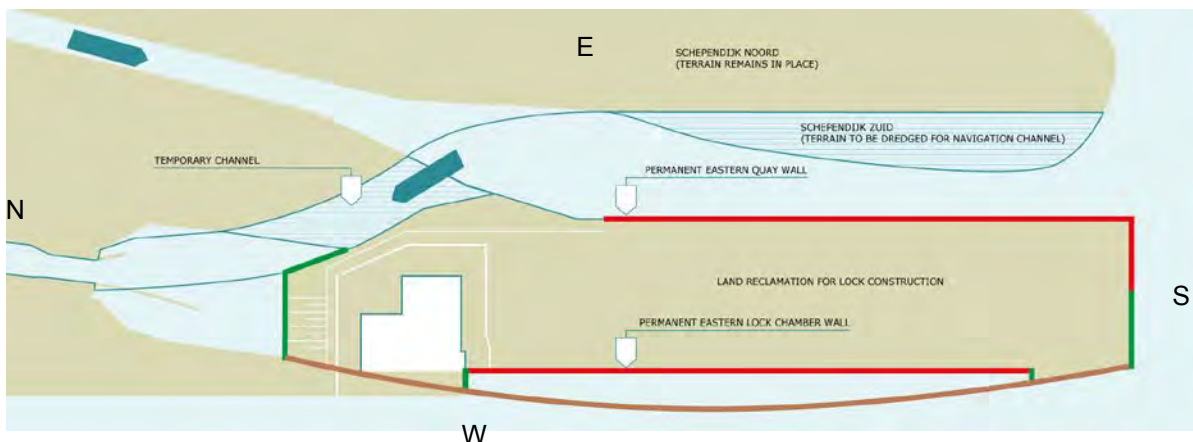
Land reclamation between 2 permanent walls (red) and 2 temporary walls (green)
